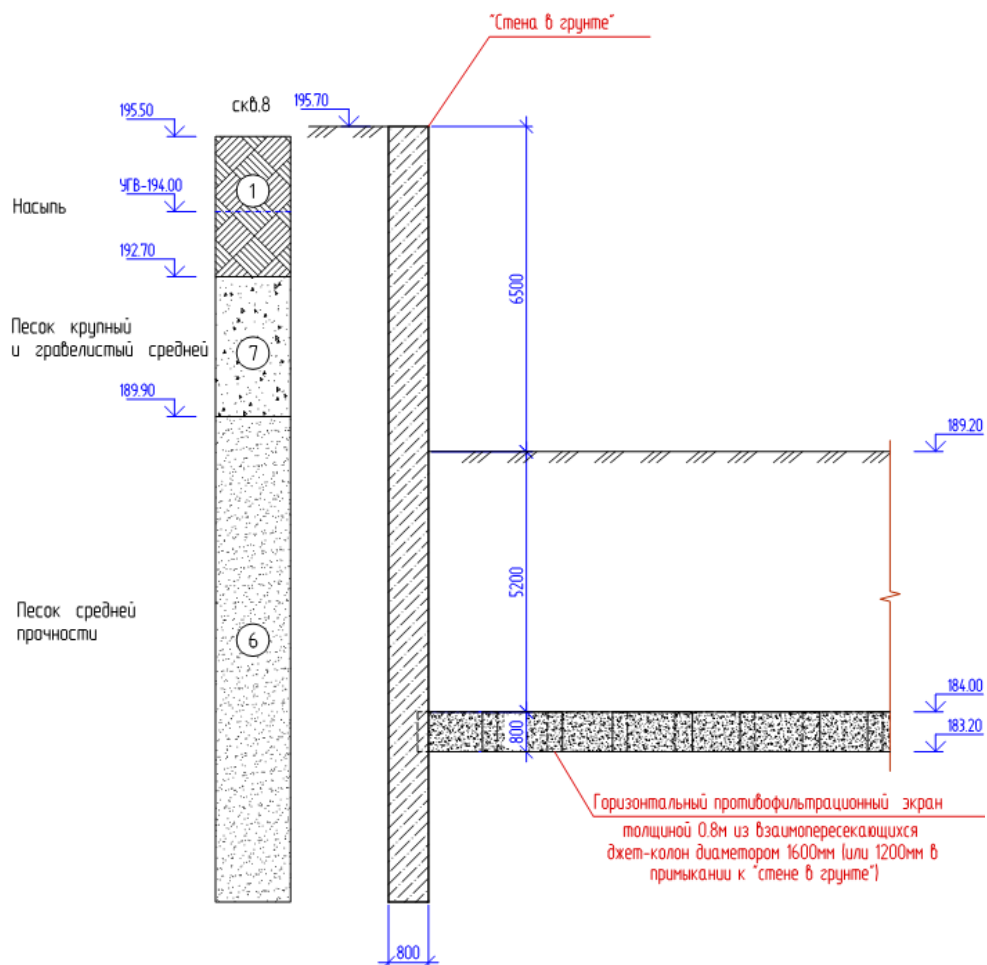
Cross section of the construction of the retaining wall and the anti-filtration screen.
